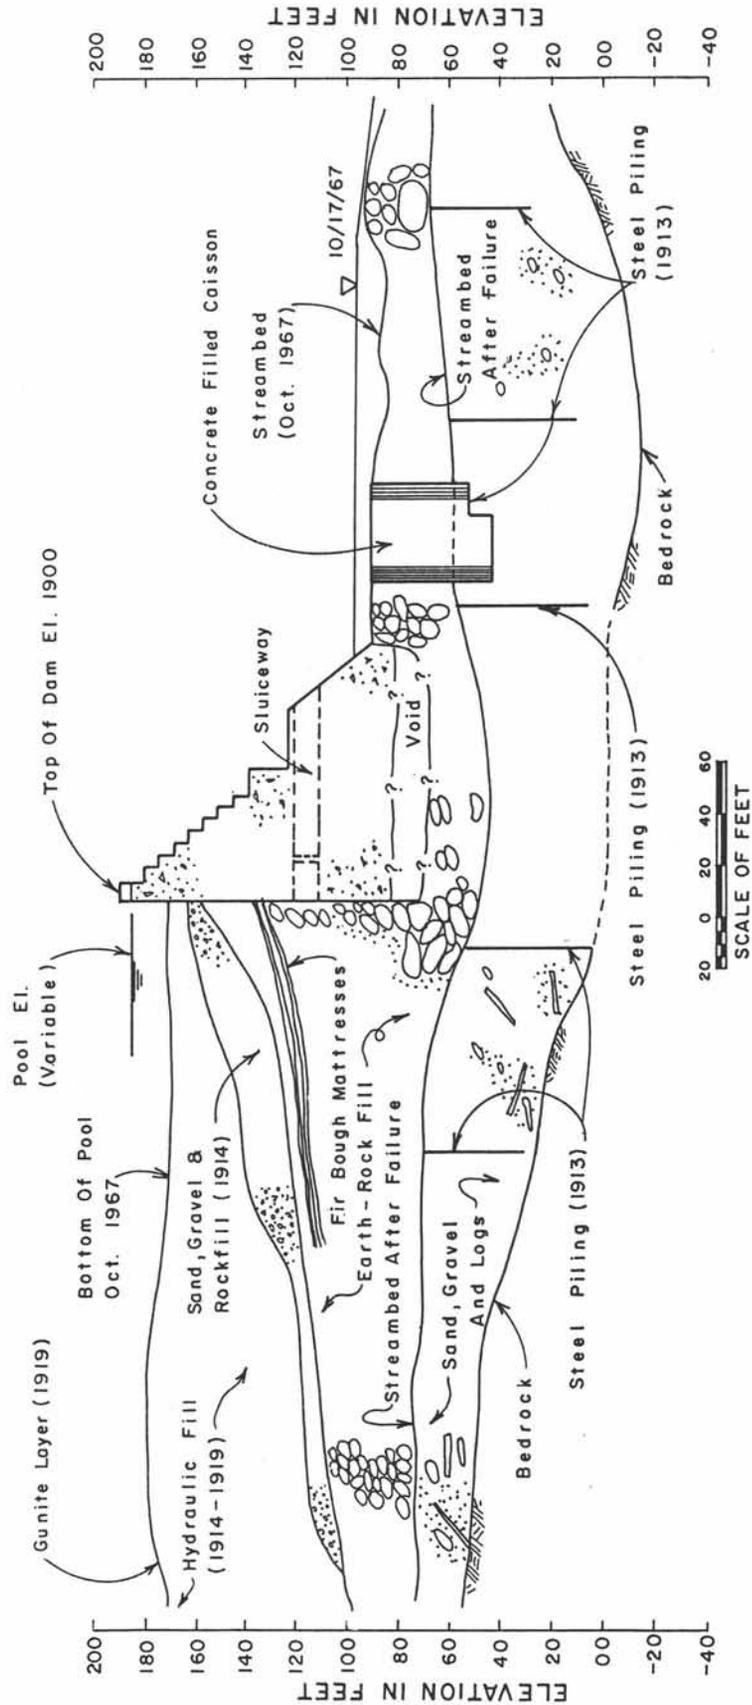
Transverse geologic section through the main gravity dam, Elwha Dam. Adapted from U.S. Army Corps of Engineers (1978).
